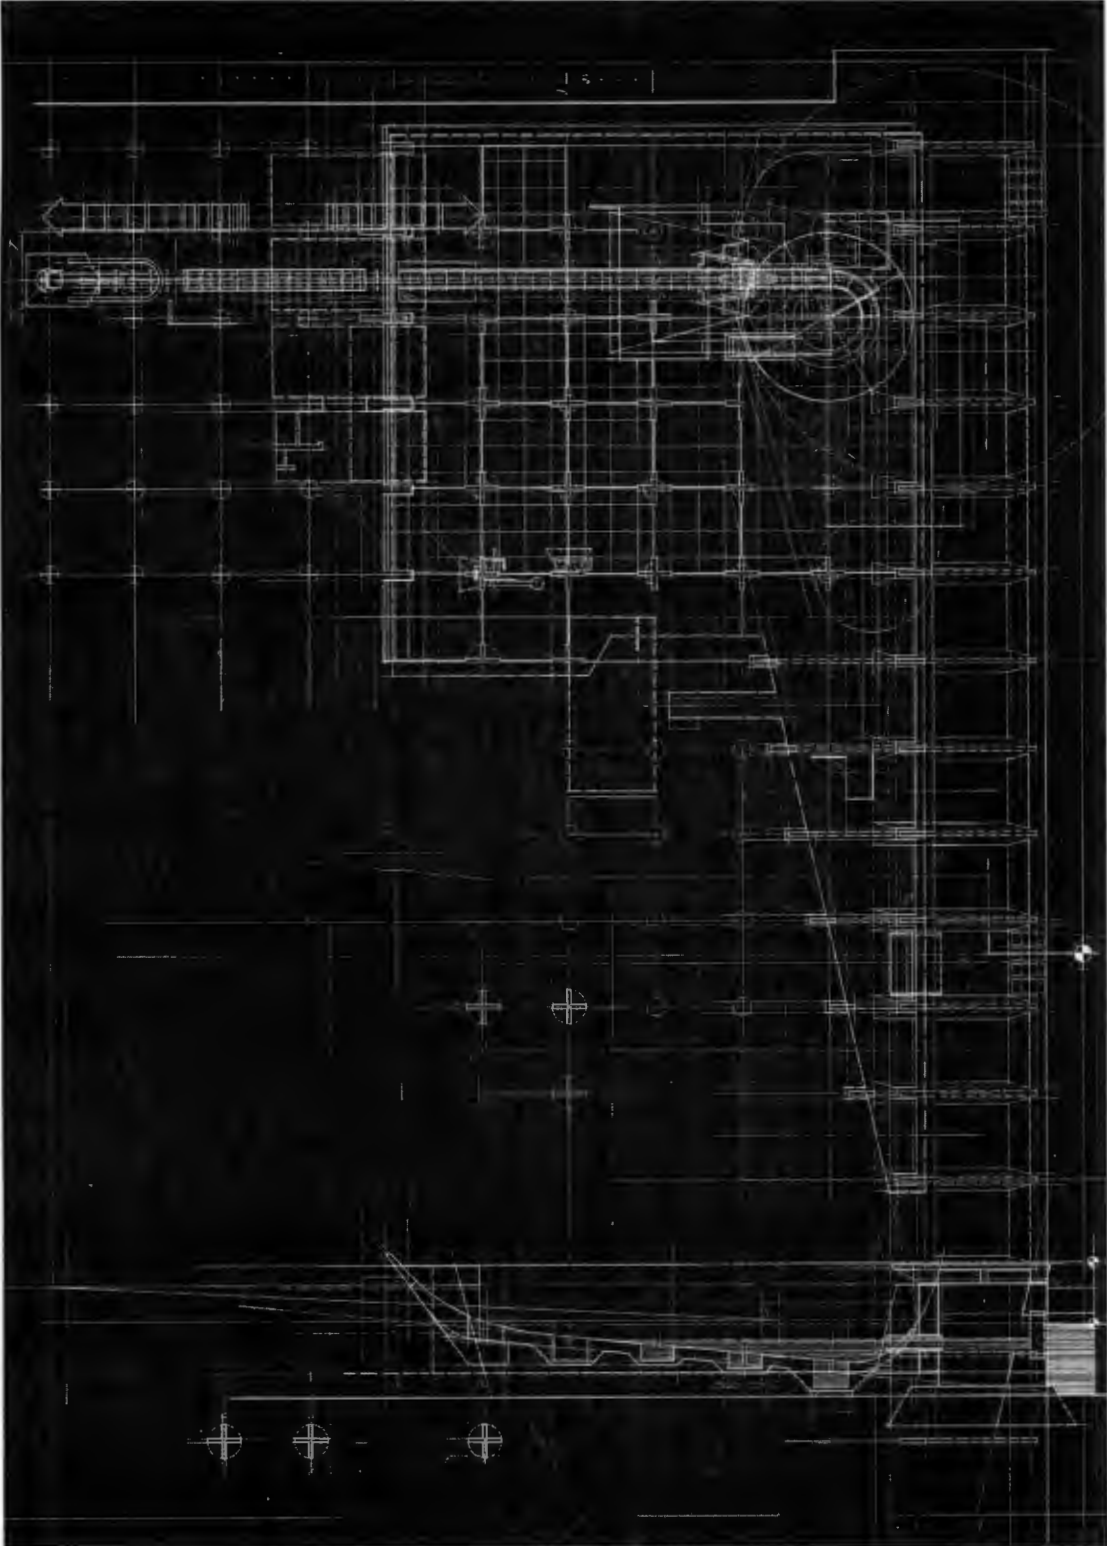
Site development plan indicates bridge element enabling access onto excavated site. Section indicates seawall manifold regulating water level on site.
